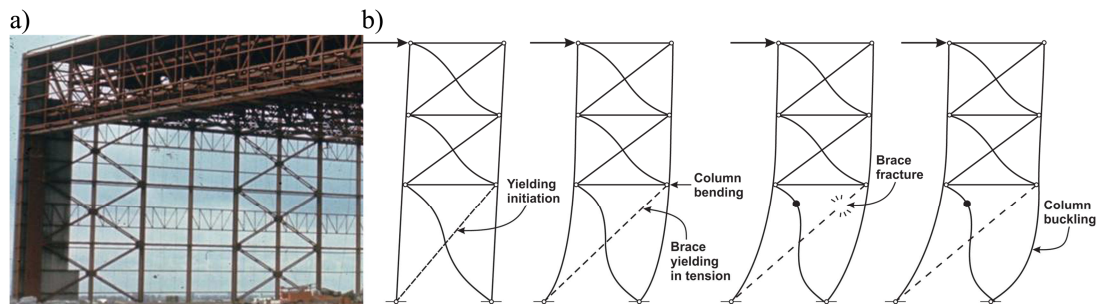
a) 3-tiered concentrically steel braced frame (Courtesy of the Canadian Institute of Steel Construction), and b) Concentration of inelastic deformations in a multi-tiered braced frame inducing high inelastic demand on bracing members and in-plane flexural demand on columns.
